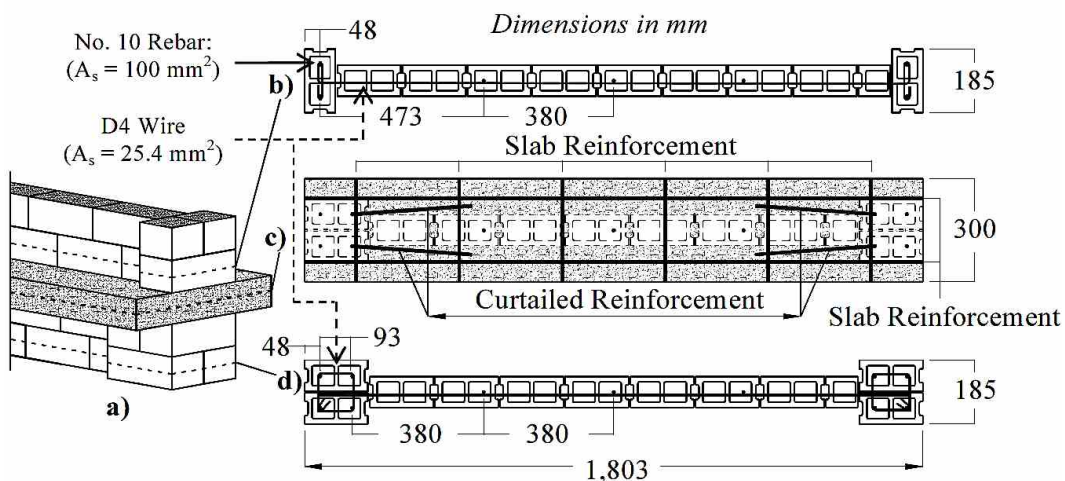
Wall 10 Curtailment Details: a) 1st Floor Slab Transition Point, b) Flanged Cross-section, c) RC Slab Reinforcement Details and Curtailed Bars, d) Confined Boundary Element Cross-Section
